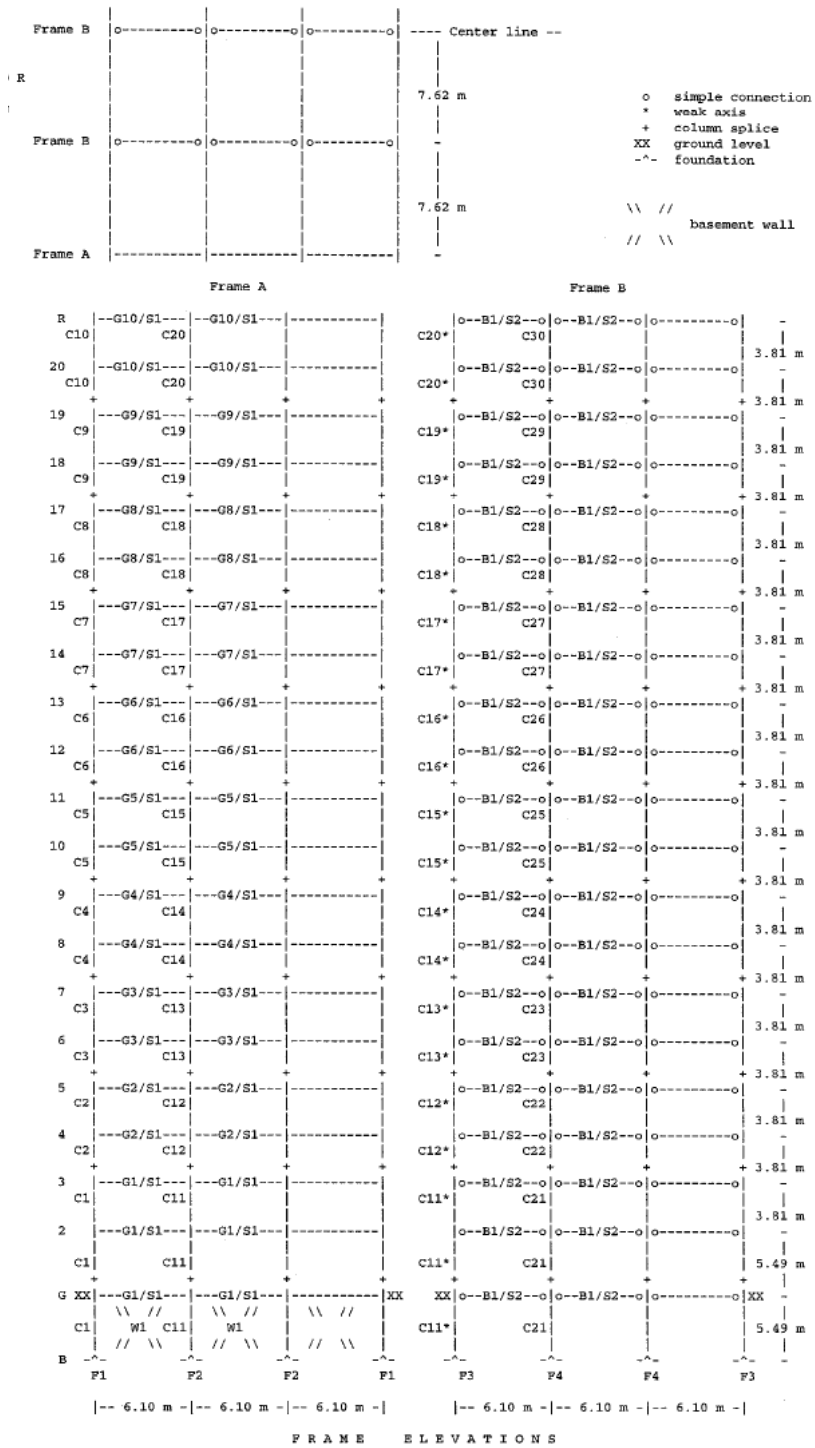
Floor plan and frame elevations of the 20-story building designed according to the UBC94 (U20) (Hall, 1997).
